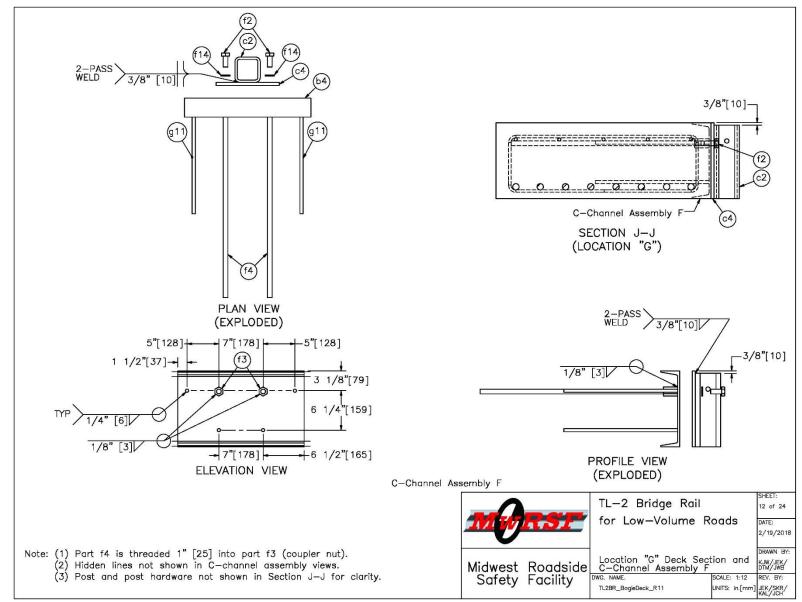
Bogie Testing Matrix and Setup, Location "G" Deck Section and C-Channel Assembly F
